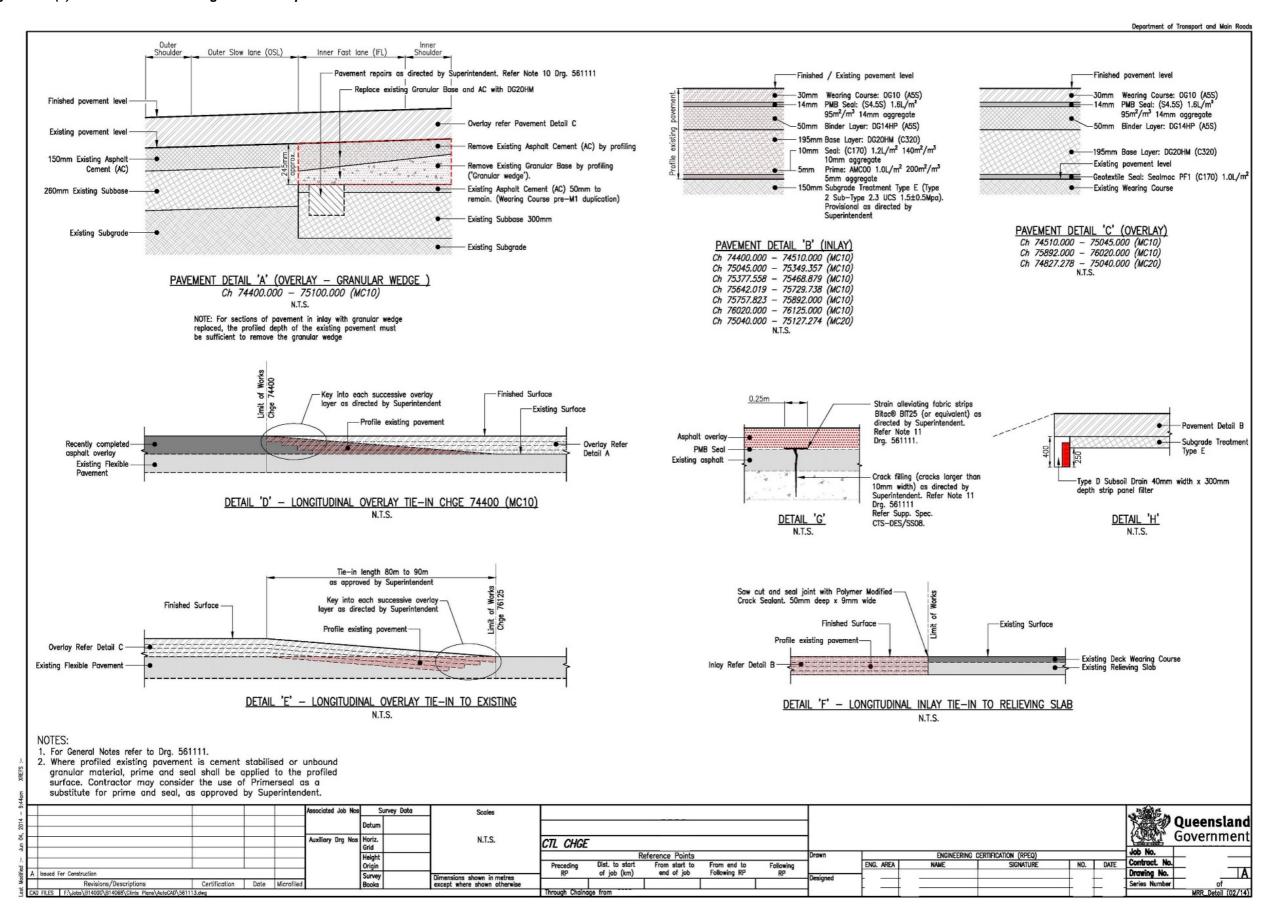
(d) – Pavement details – generic example 4 – sheet 1 of 2
